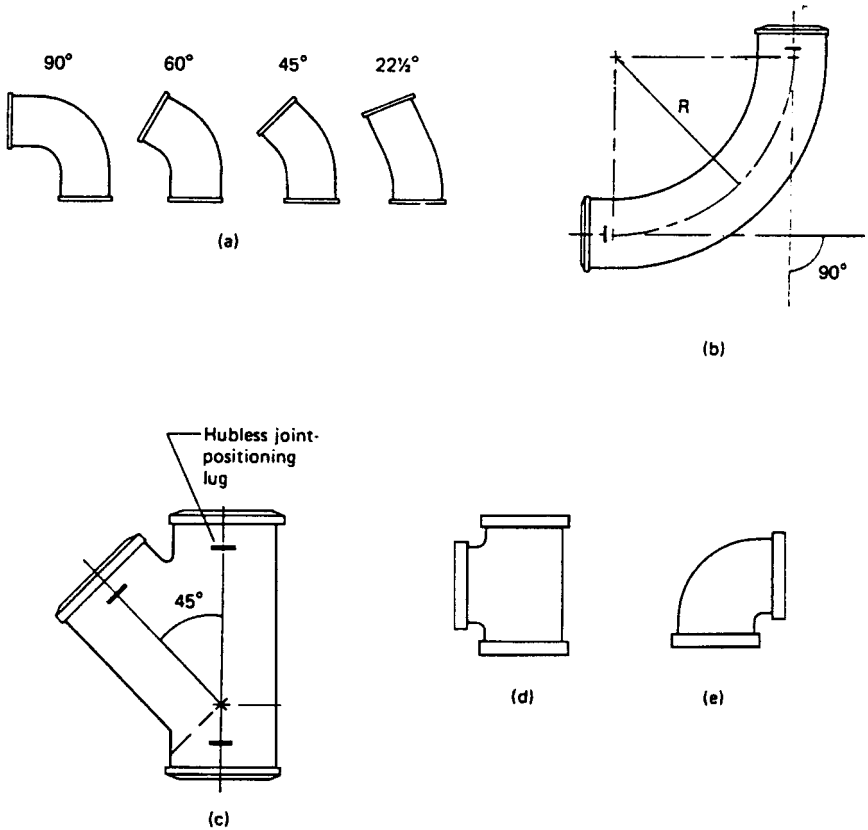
Typical fitting shapes. (a) 90°, 60°, 45°, and 22½° bends; (b) 90° sweep; (c) 45° sanitary wye; (d) standard tee; (e) elbow.
